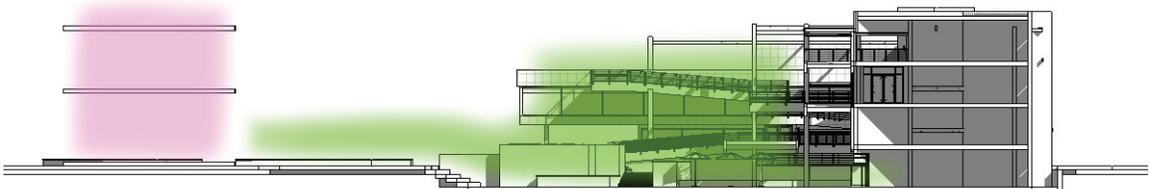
Building section and rendering looking at relationship of building and public realm on ground floor.
